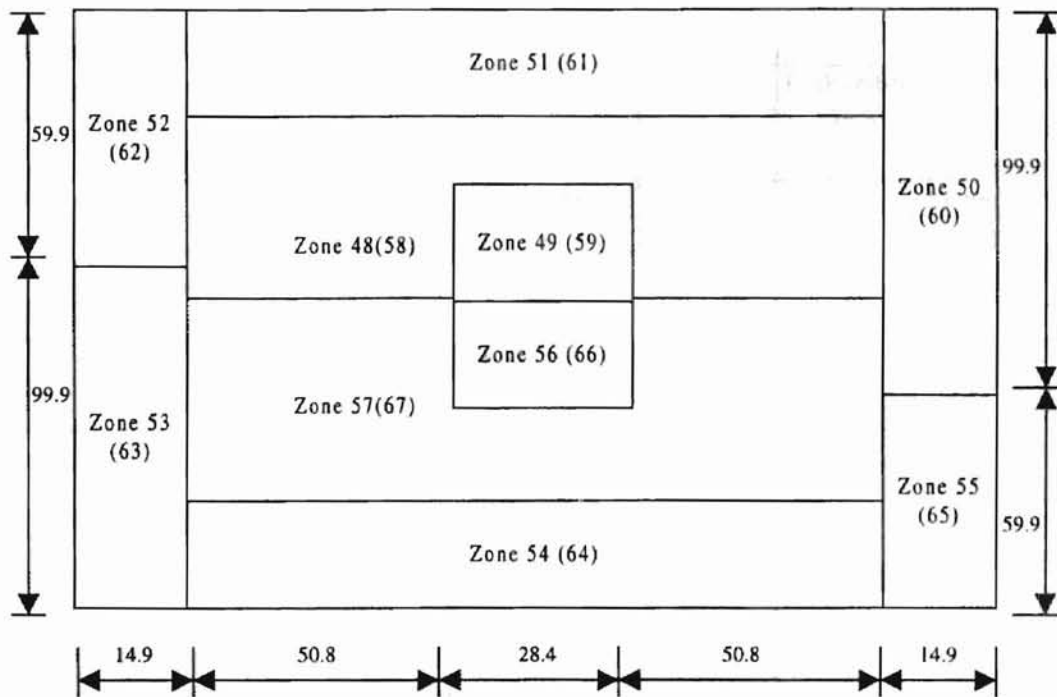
Zone Layout for Floors 39 – 51 (52)
